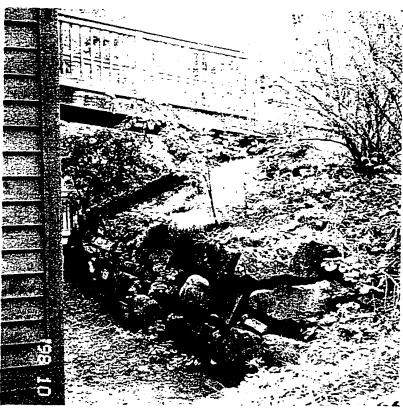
Retaining wall at large barn #2/visitor's center, 1998. (Photograph by the author).
